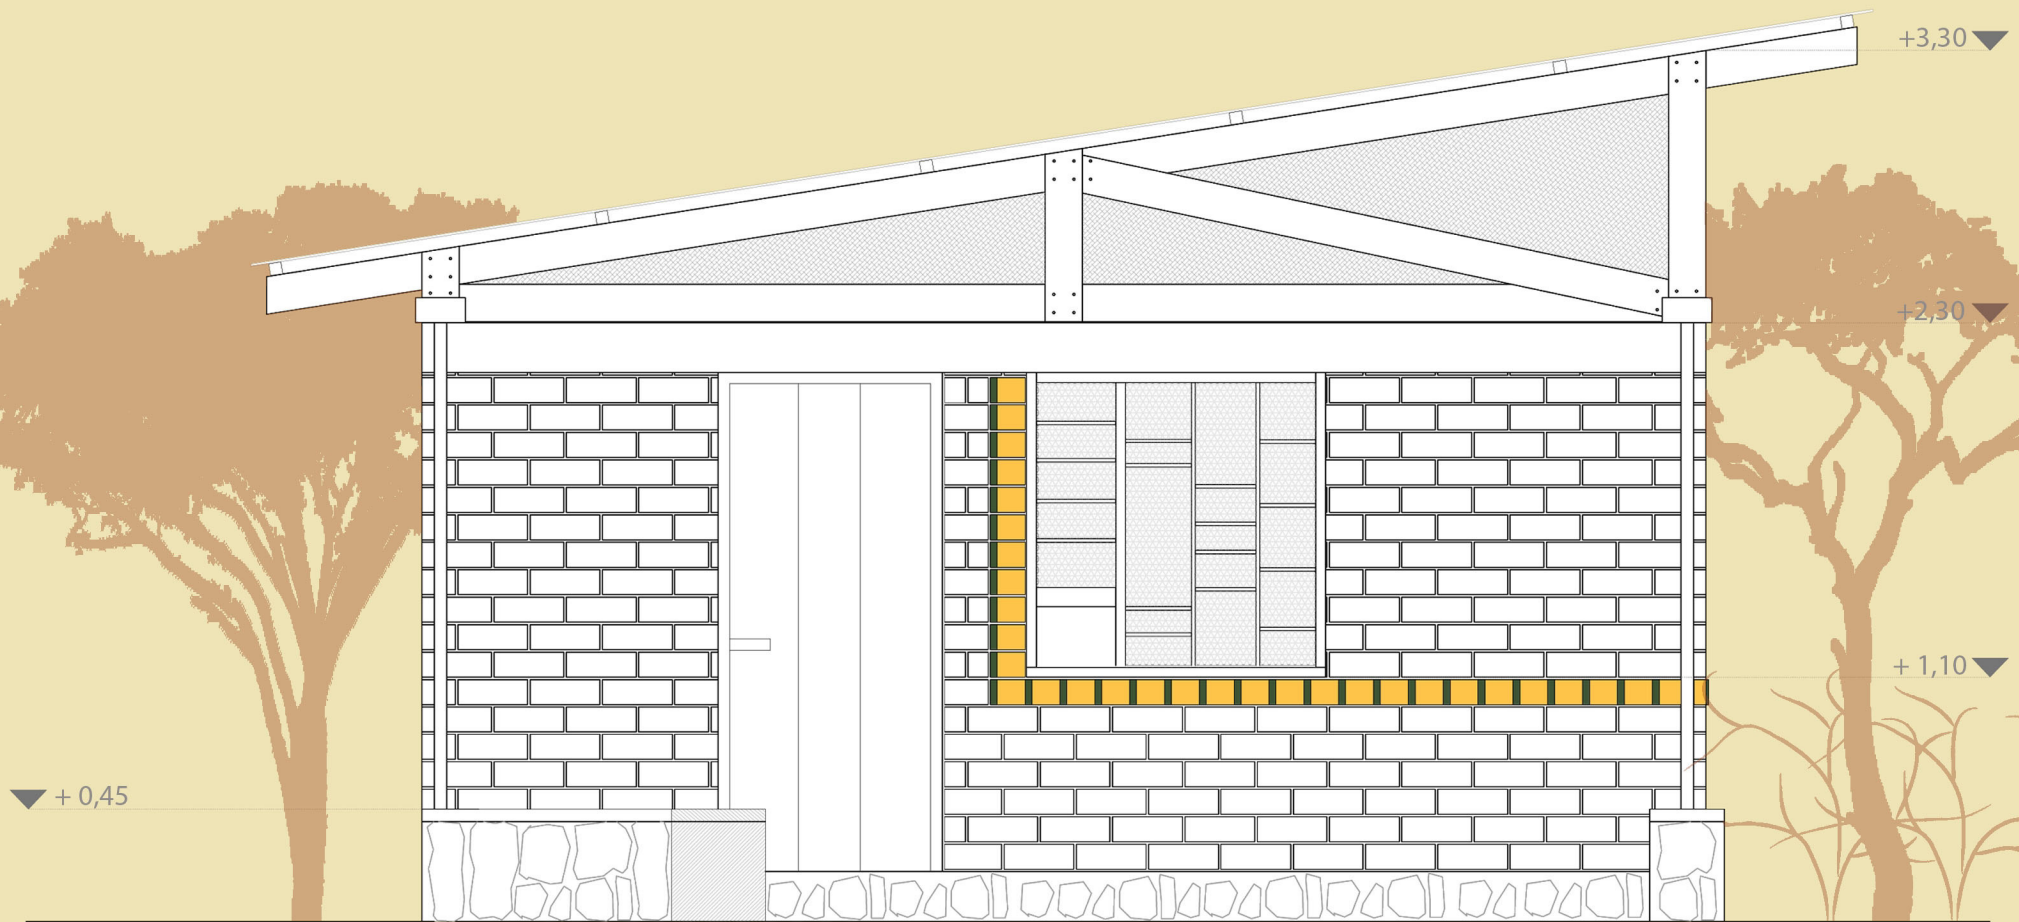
DETAIL | The foundation of the building is entirely made out of rocks and rises up to 40 centimetres above groundlevel. This plinth then takes the role of a curved bench when it leaves the red brick structure and clearly demarcates the boundaries of the covered outdoor space.
